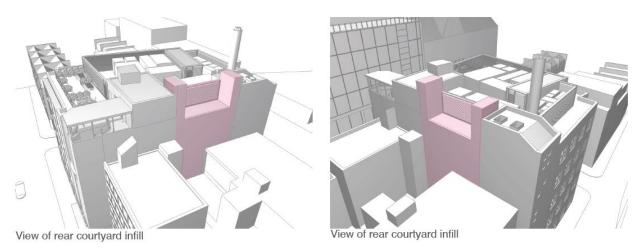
3D views of rear courtyard infill (source: BMJ Architects, 2021)
